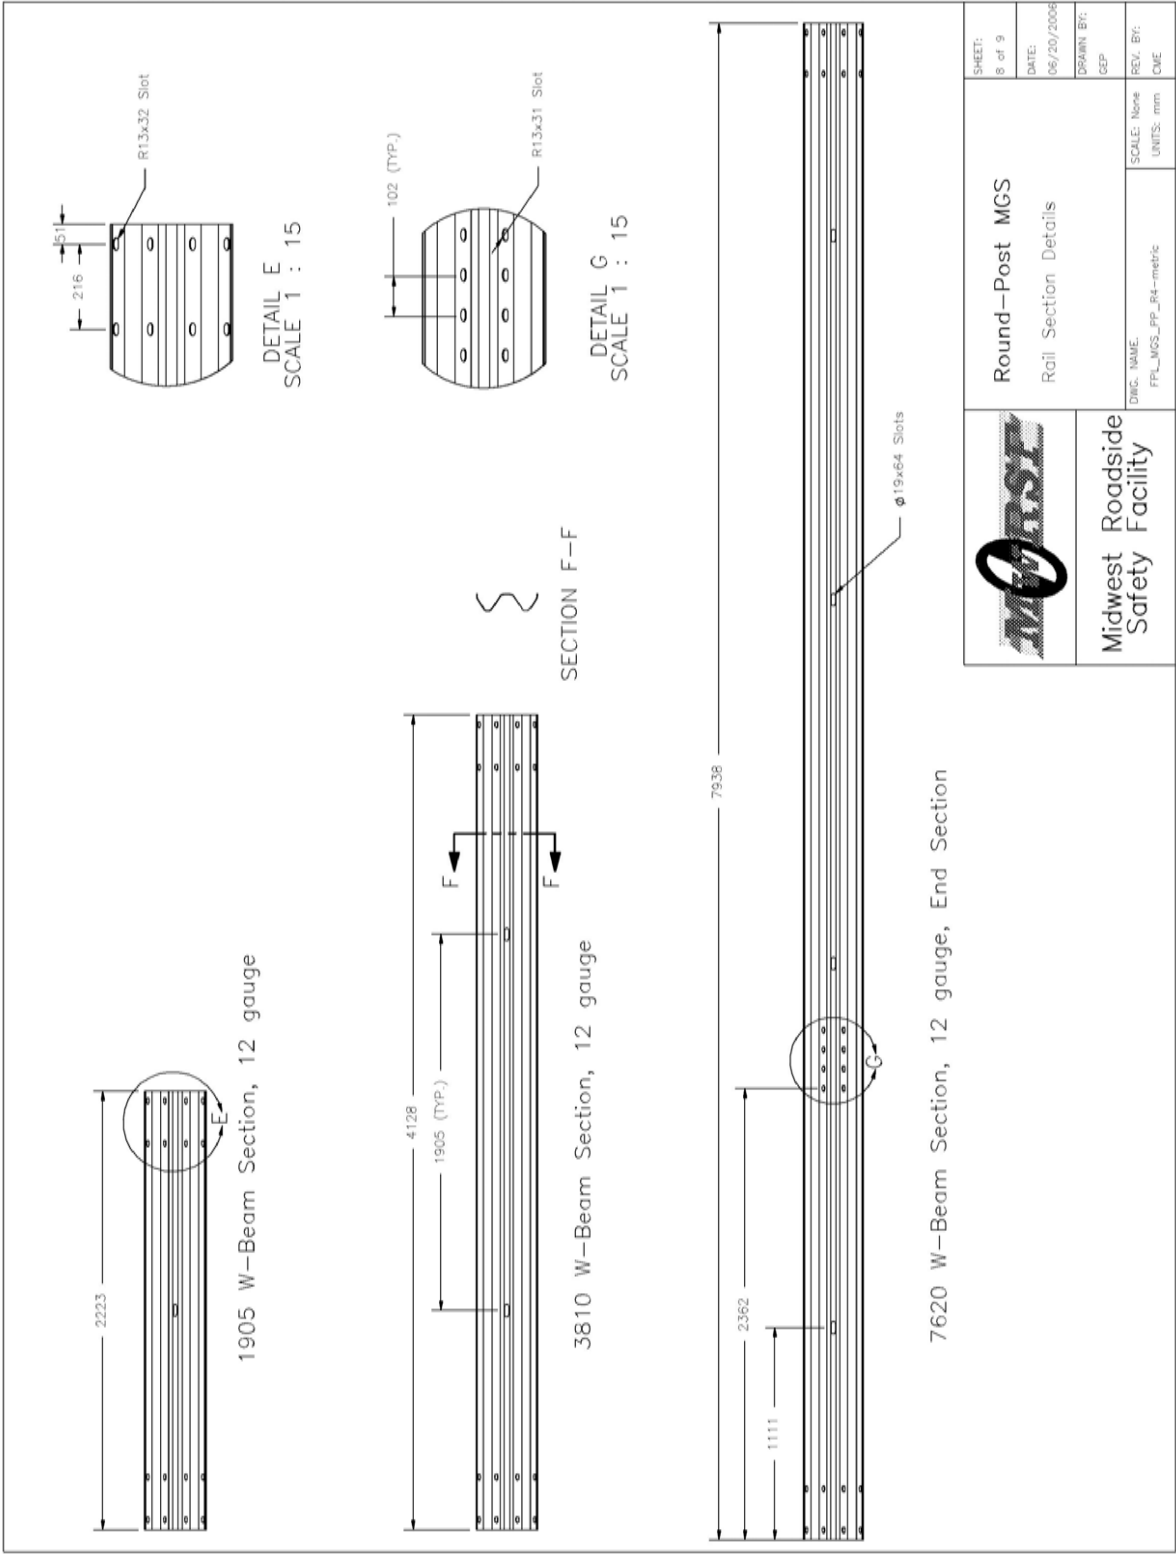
MGS Round Post Ponderosa Pine Details – Rail Section Detail
